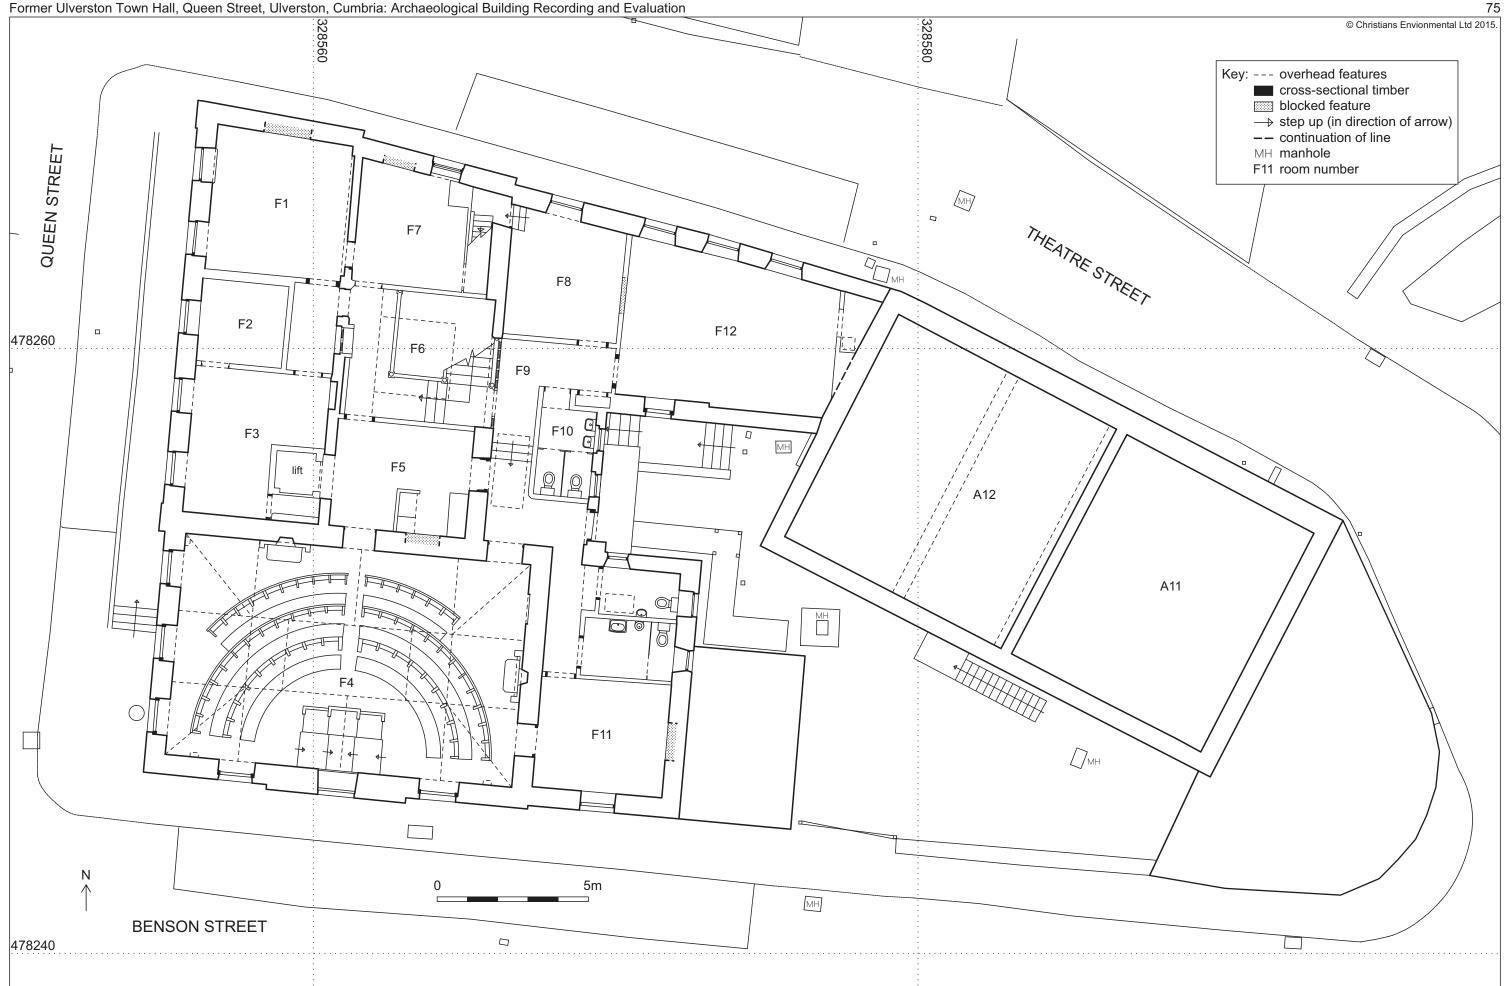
Ground floor plan of the main building and first floor plan of the east end
